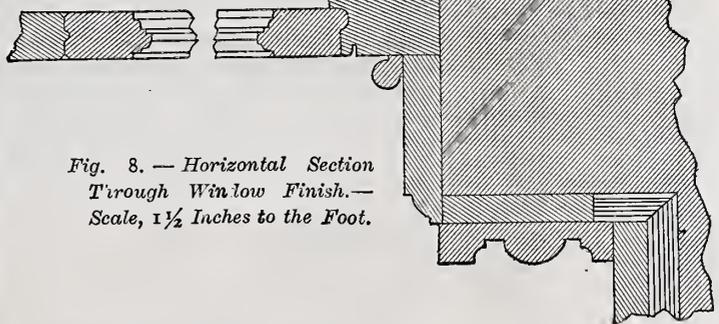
Horizontal Section Through Window Finish.—Scale, $1\frac{1}{2}$ Inches to the Foot.
